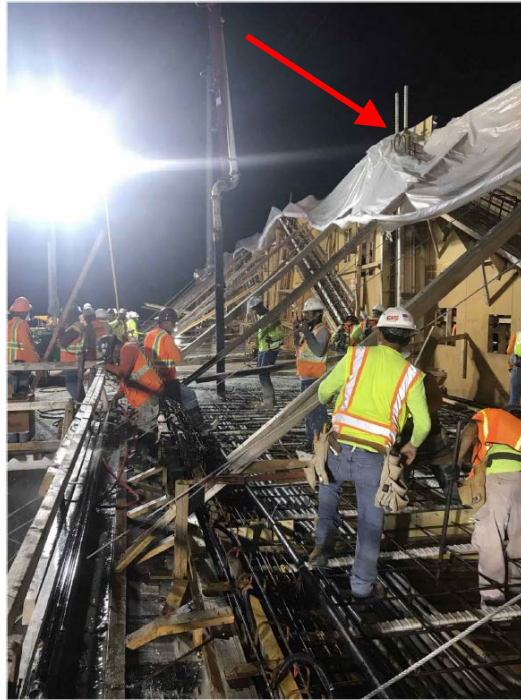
October 19, 2017: Deck concrete placement, location of construction joint indicated with red arrow.⁷⁹
